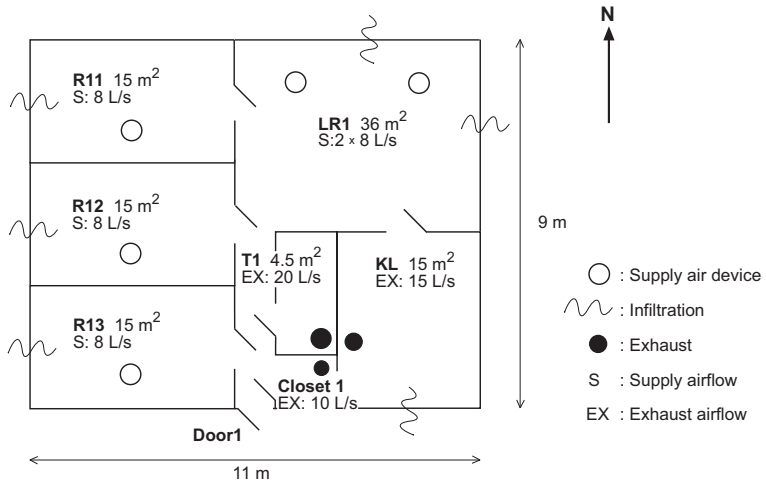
The apartment at floor one with supply, infiltration and exhaust flows
